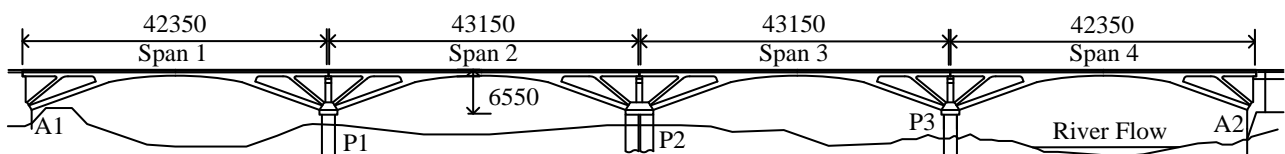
Elevation View of Xiaoyudong Bridge (unit: mm)
